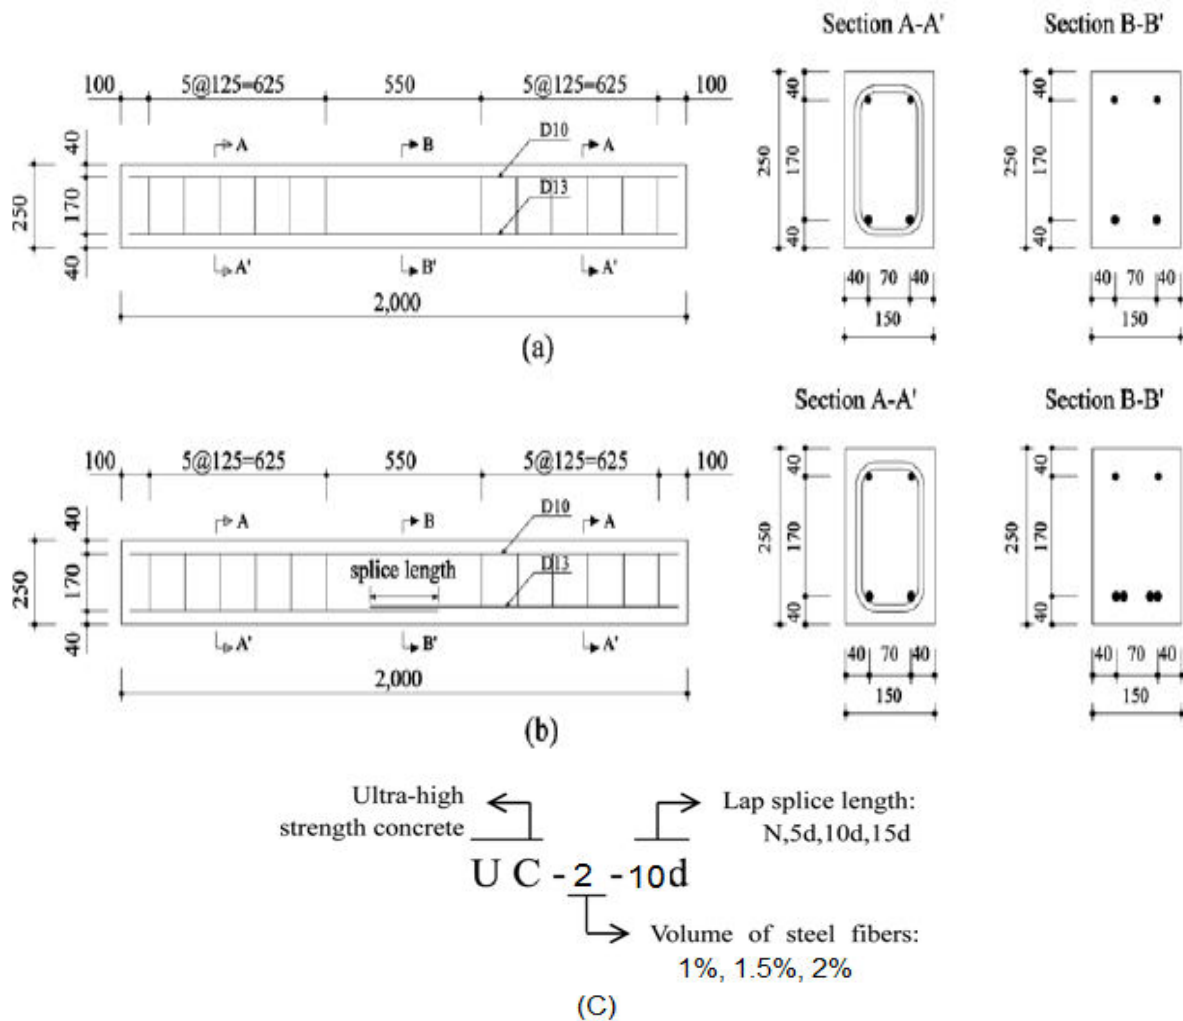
Geometry and details of the UHSC beam specimens (a) UHSC beam specimen, (b) Lap-spliced UHSC beam specimen, (c) Designation of the UHSC beam specimen.
